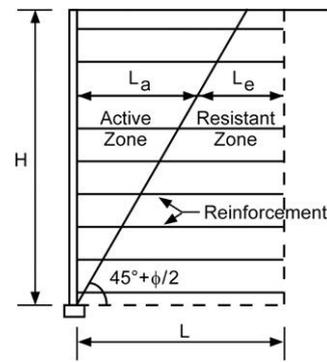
Location of potential failure surface for internal stability design of reinforced soil retaining walls with geosynthetic reinforcement.
